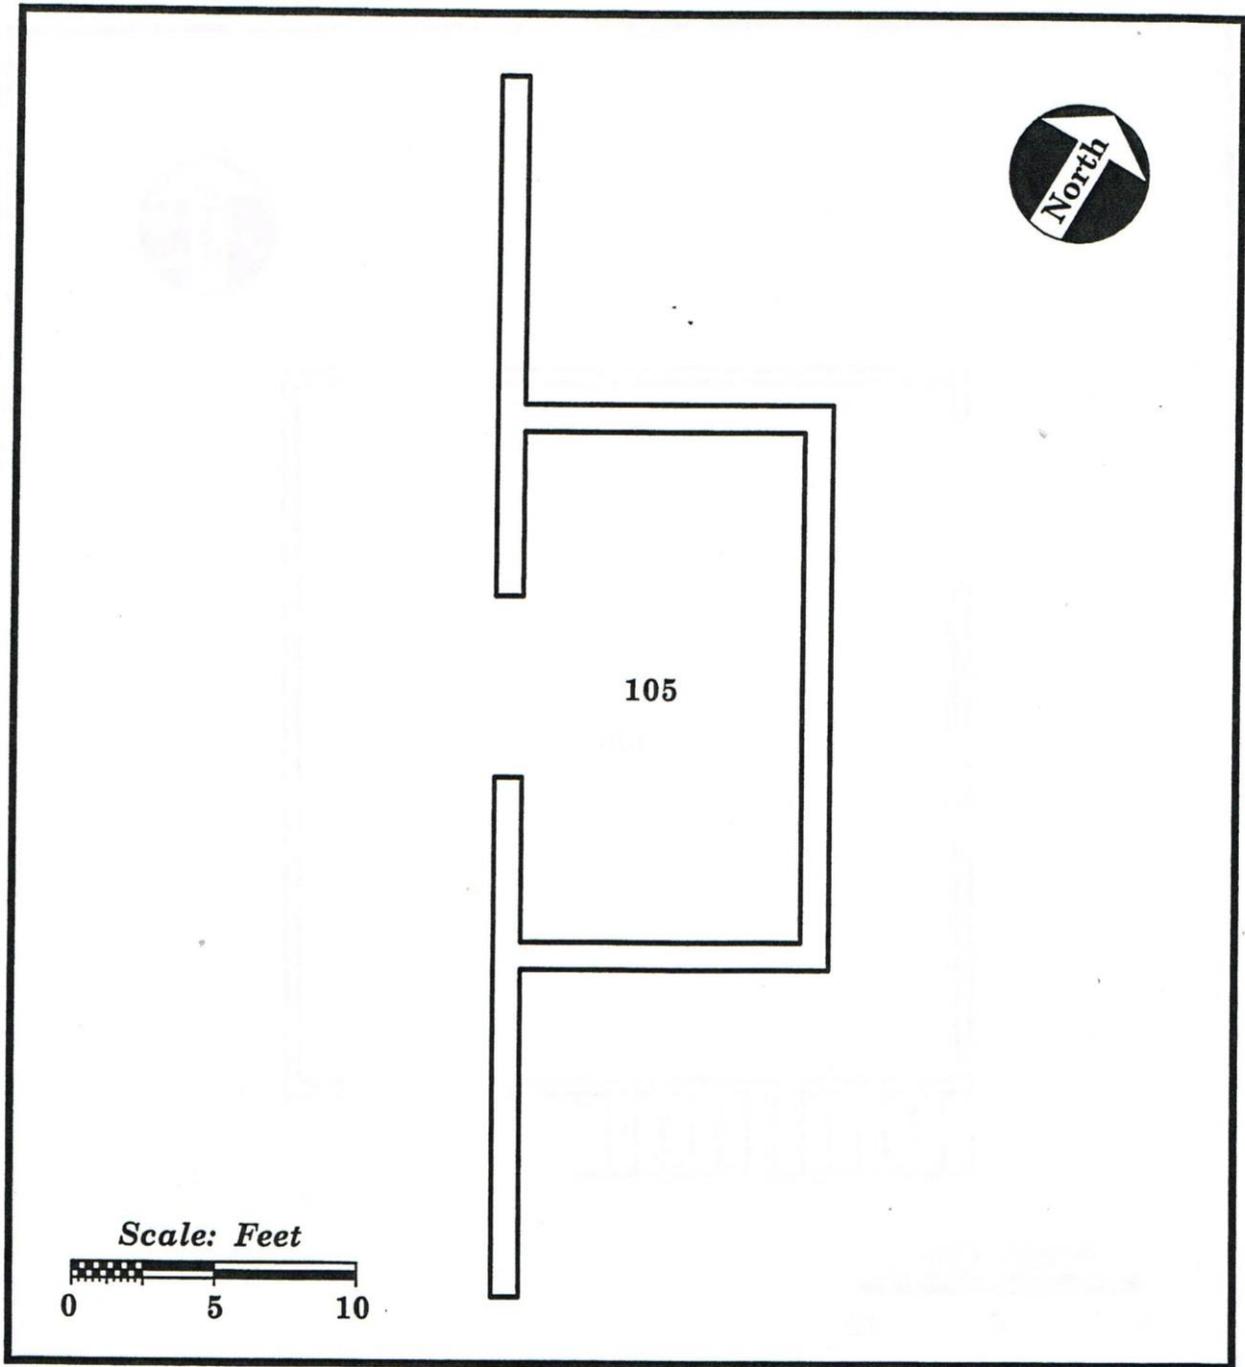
Building 817C, Facility Plot Plan, 1997. LLNL Archives, (Figure A-12)
